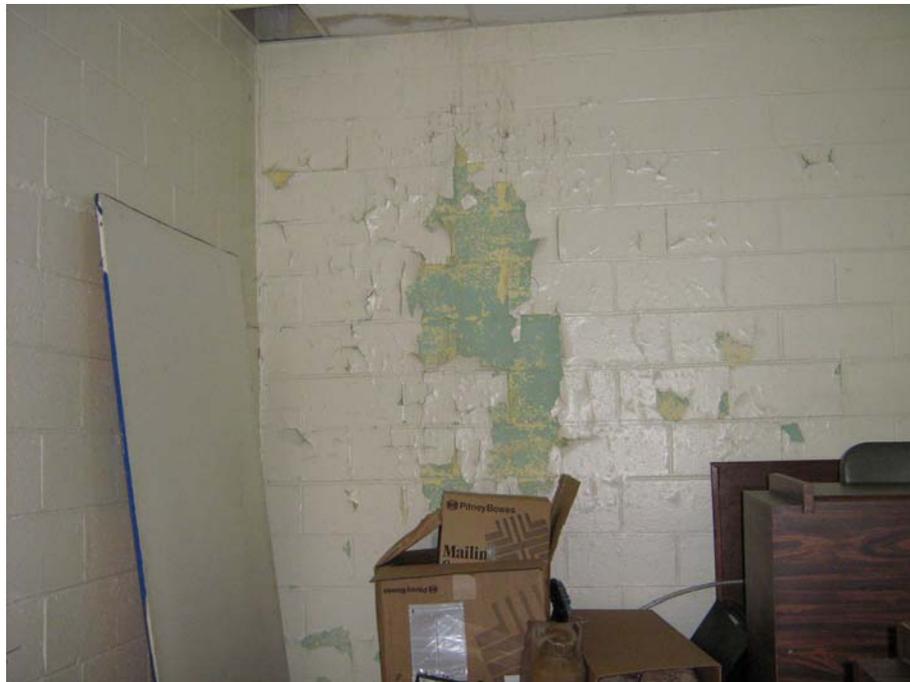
Severely Peeling Paint in Training Room near North Side of Building
